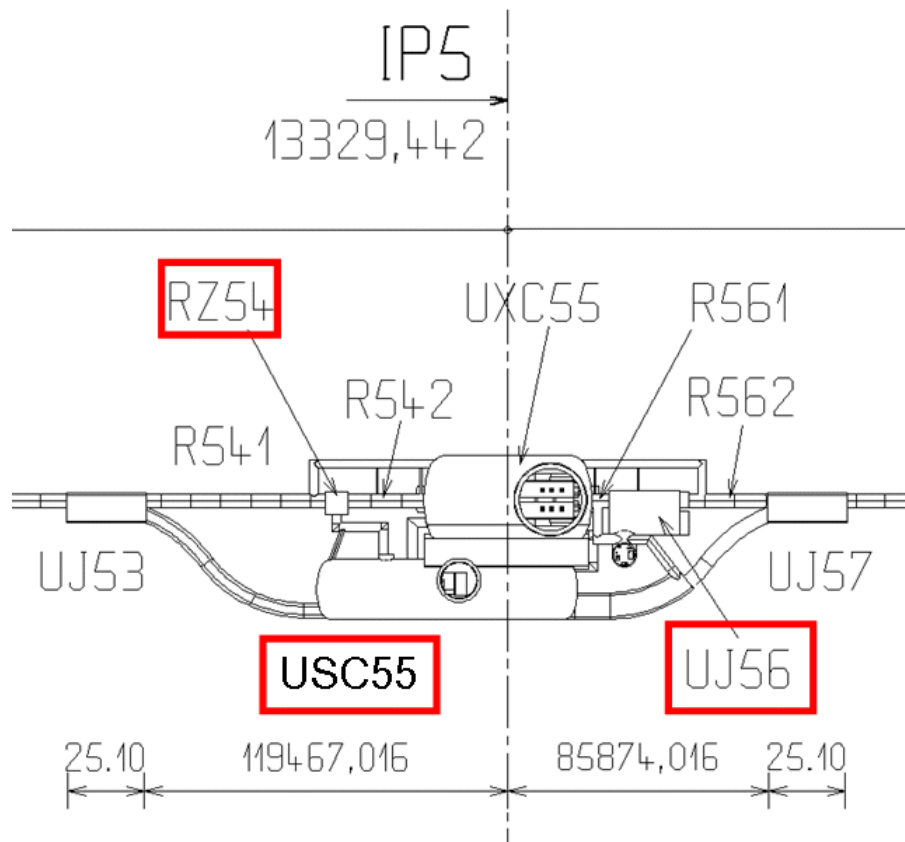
LHC tunnel (R542 and R561) and equipment alcoves (USC55 and UJ56) around the CMS (UXC55) cavern.
